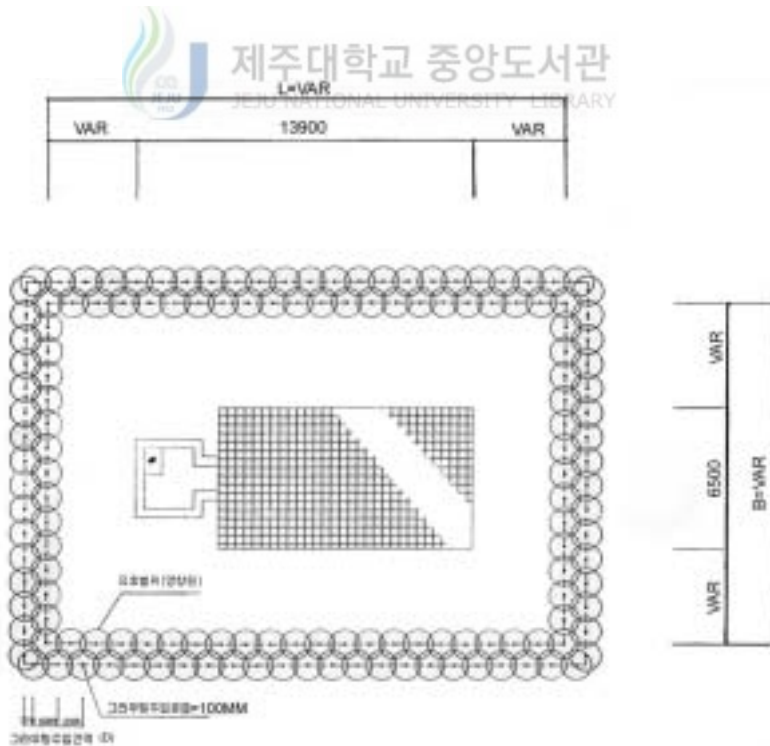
Ground Plan of Pumping Station(Jo-chun)
